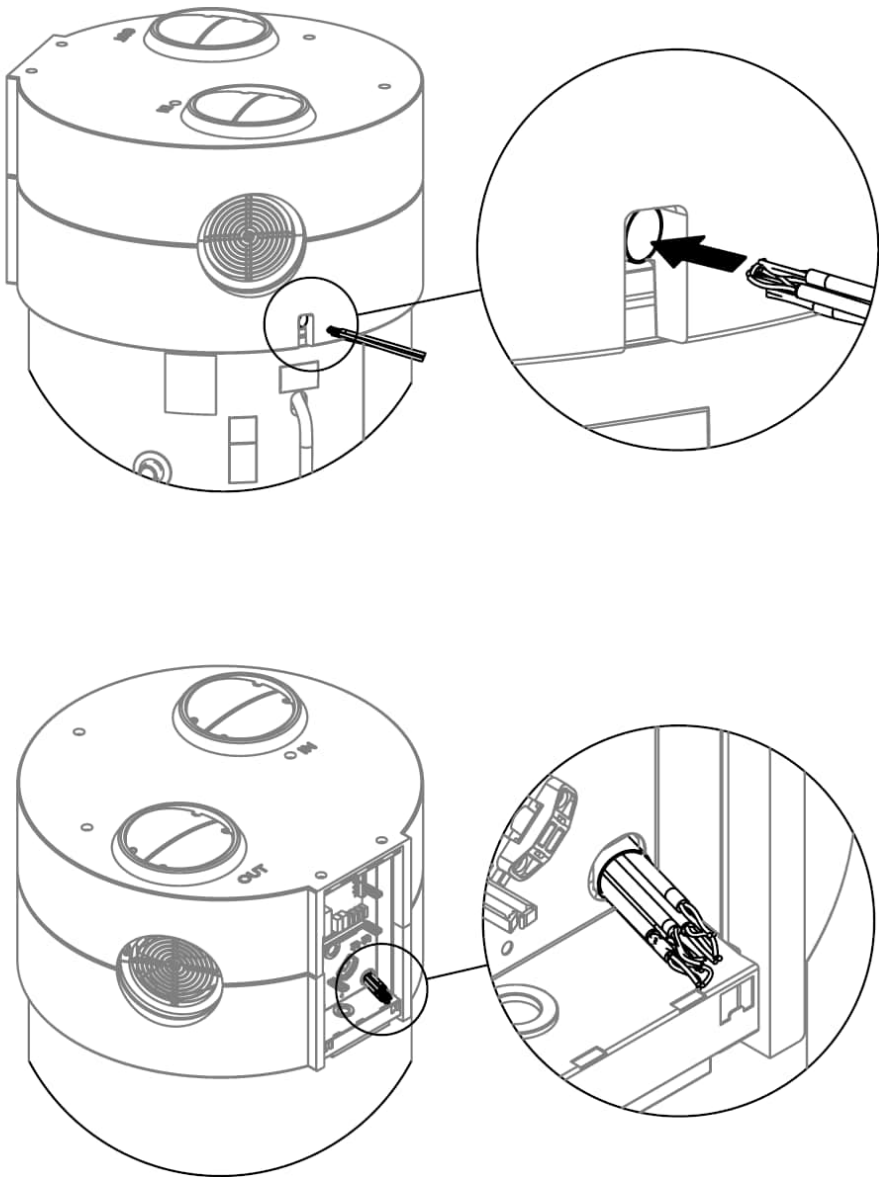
Wiring external electrical components (recirculation pump, external boiler, etc.)
